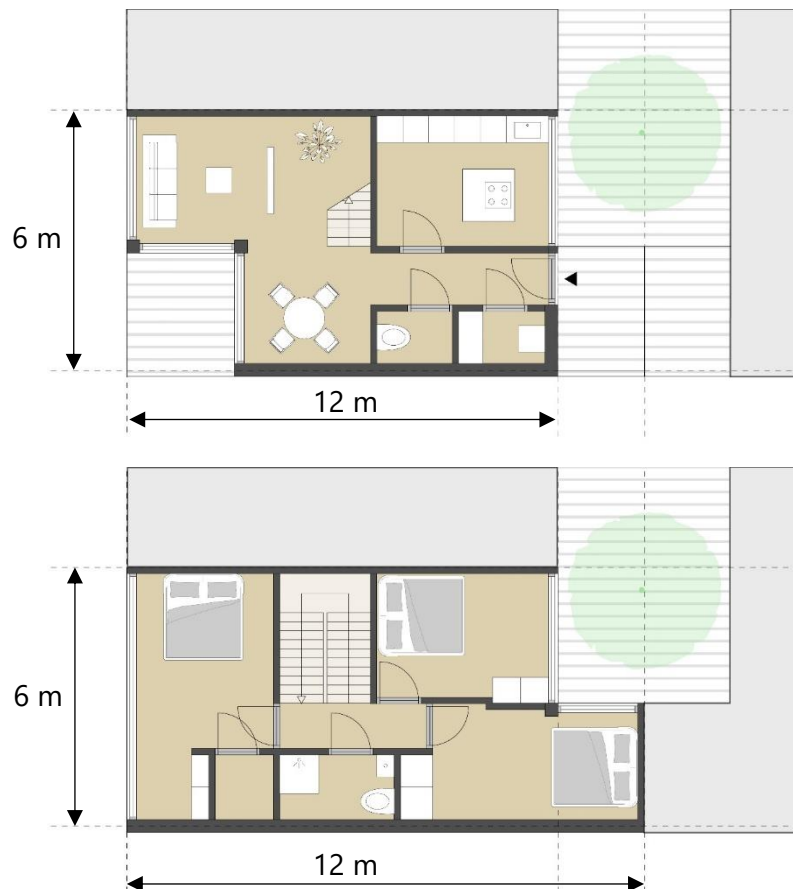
Floorplans of the reference house (above ground floor, below first floor)
